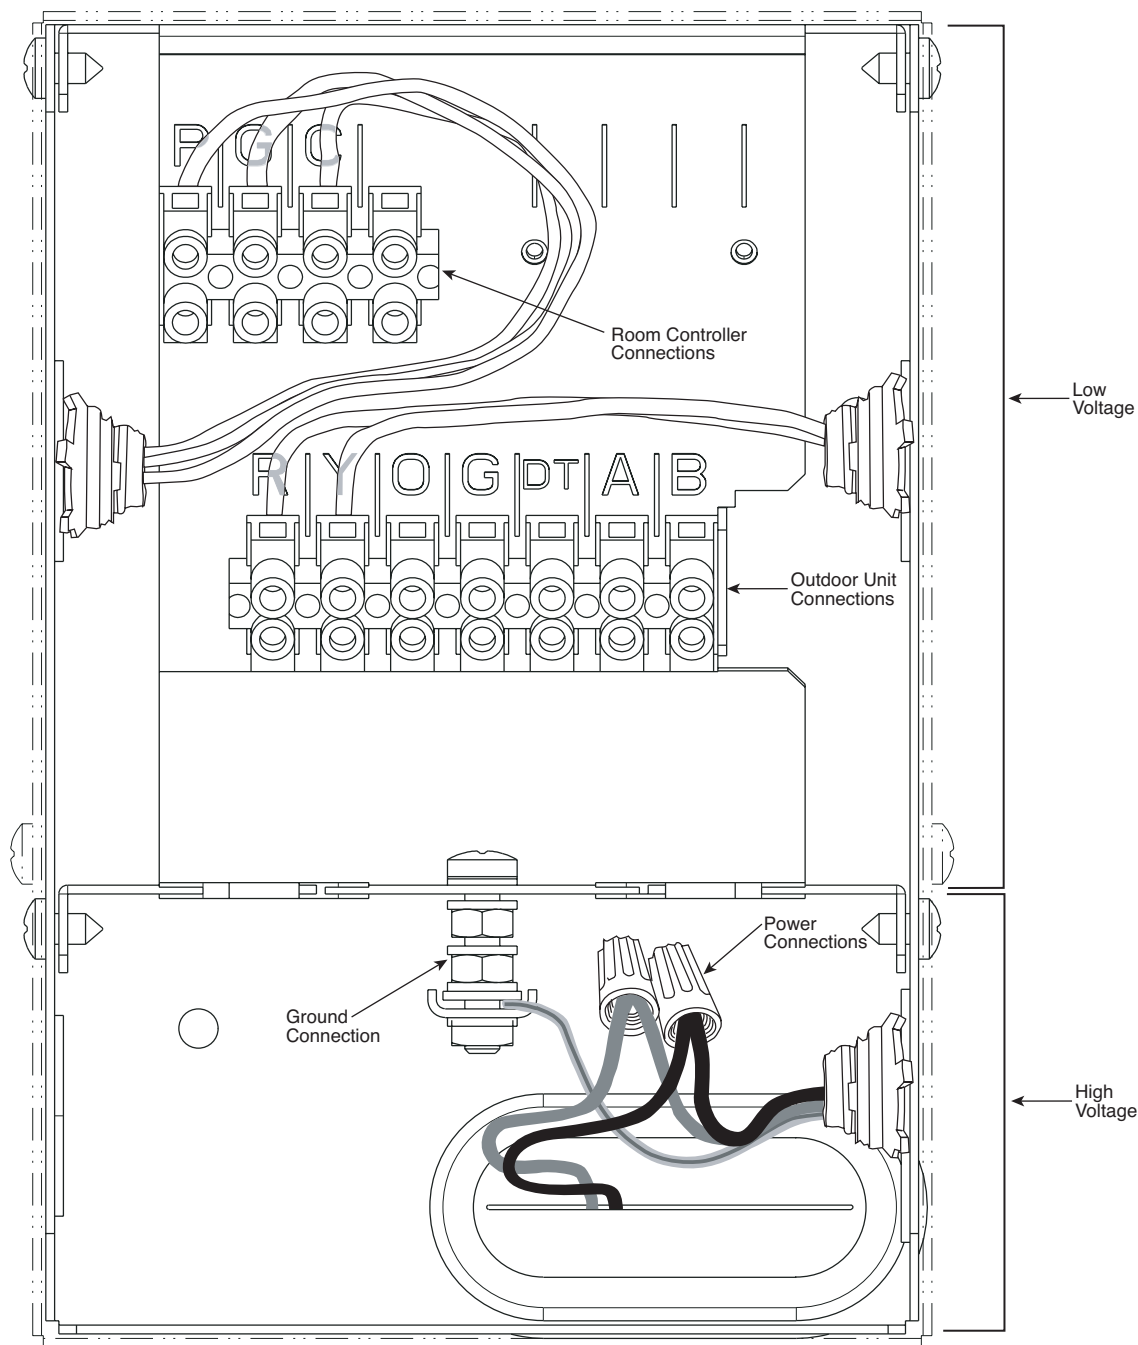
619FNQ Unit Matched to 538ENF Outdoor Unit — Wiring Connection (Cooling with Electric Heat System)
